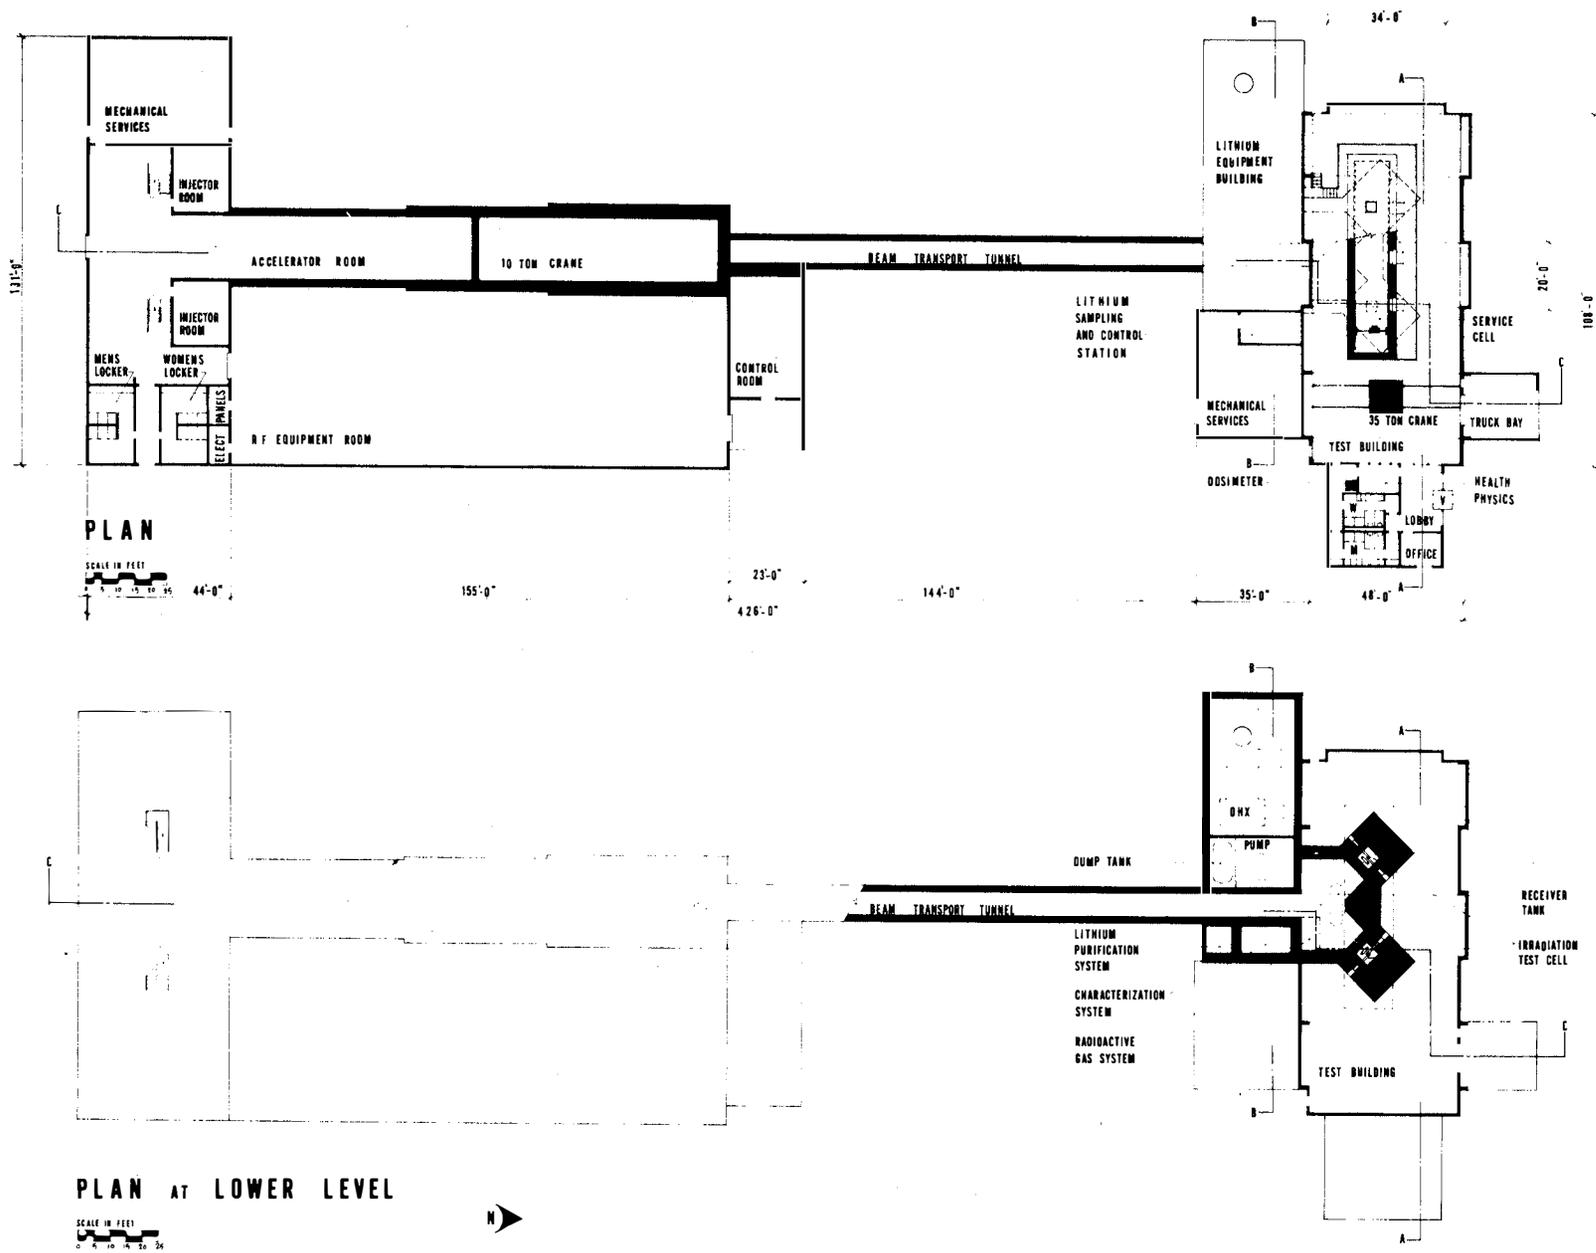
Deuterium-Lithium High Flux Neutron Source Facility - Plan View.
